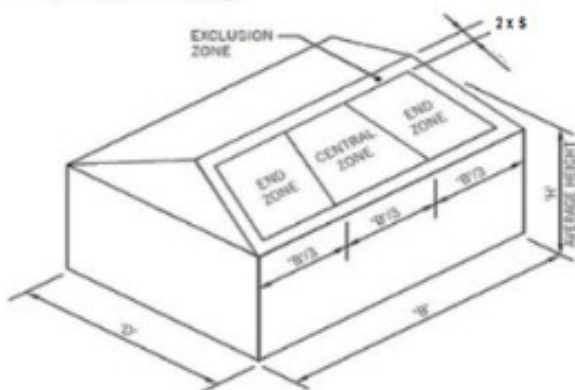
PANEL MOUNTED PARALLEL TO ROOF PLANE
